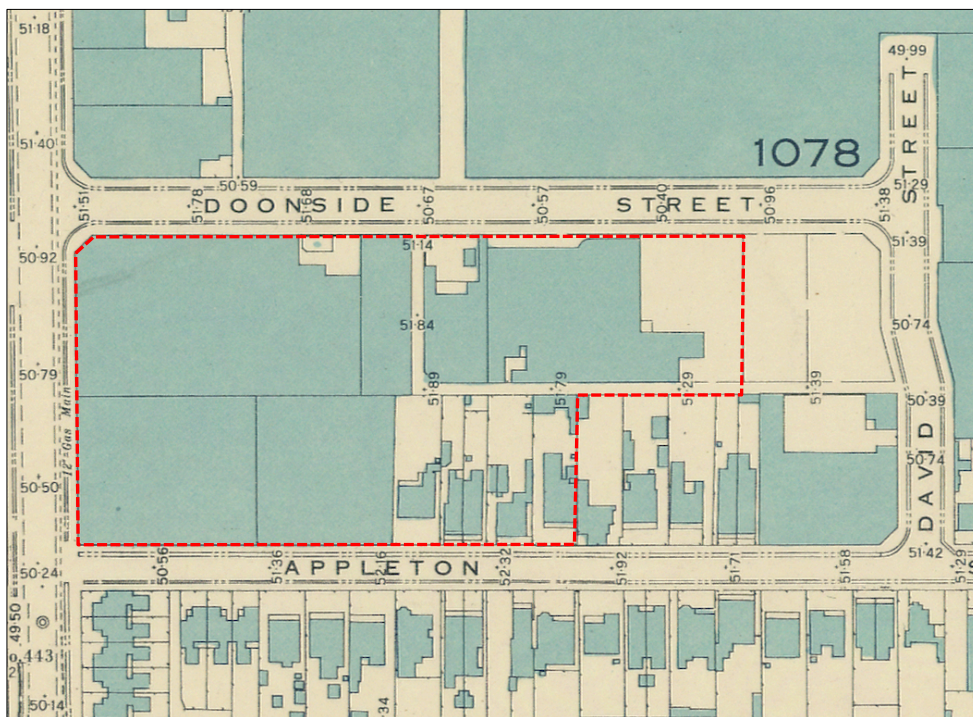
Extract from a 1950 MMBW plan showing most of the subject site developed with factory buildings but with five modest dwellings remaining on the Appleton Street frontage. Source: State Library of Victoria.
